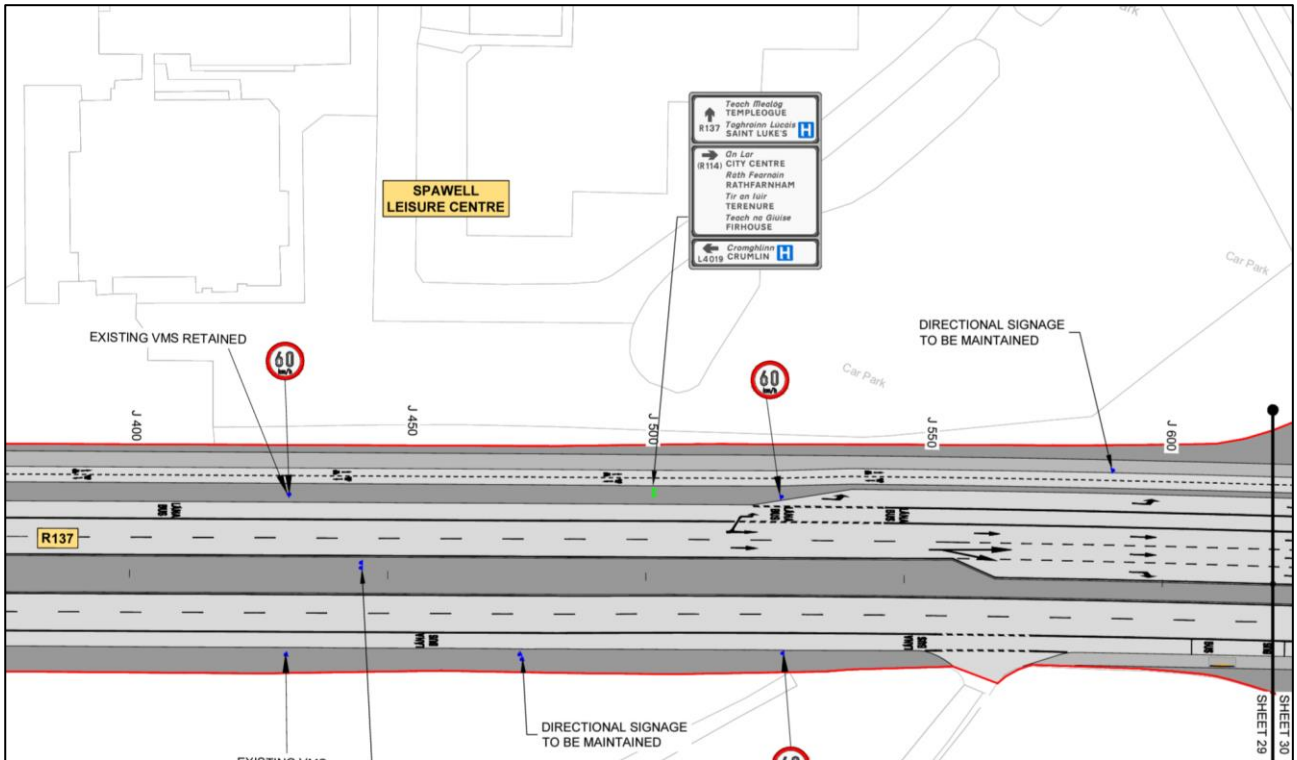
Extract from Traffic Signs and Road Markings Drawings (Sheet 29)
